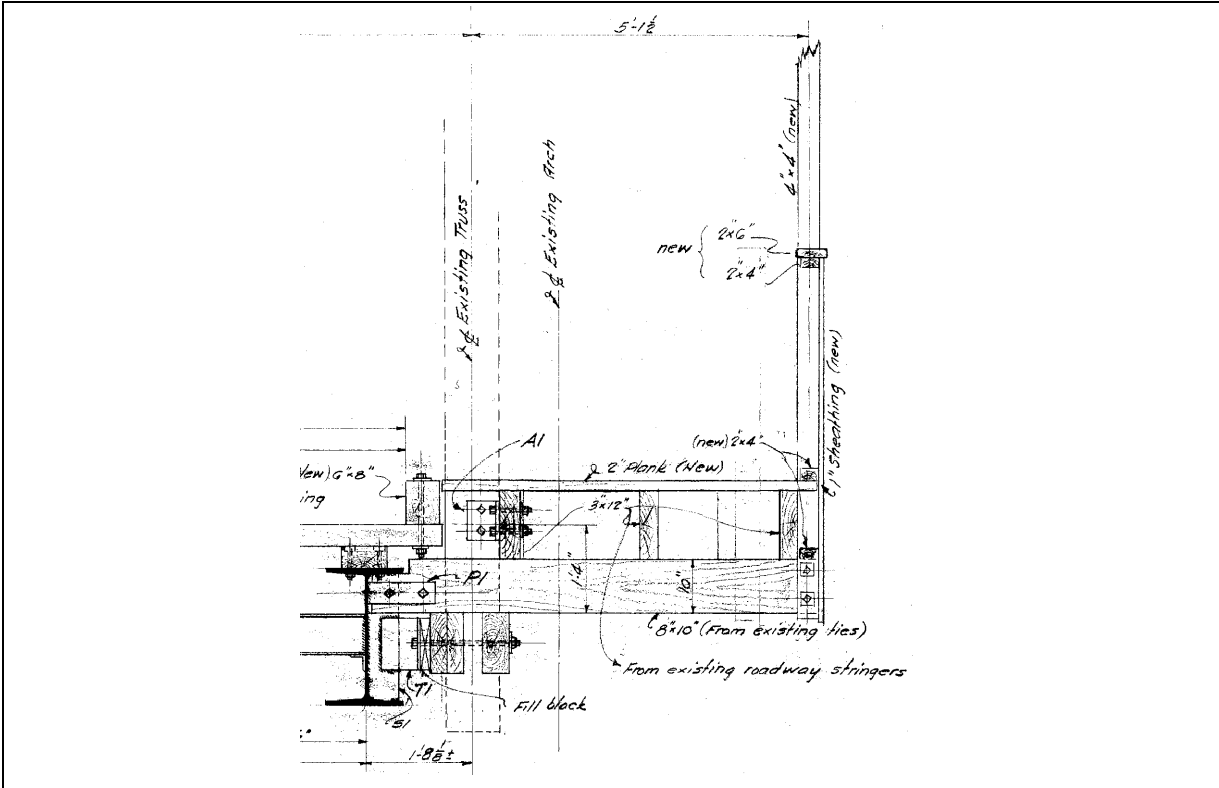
Sidewalk assembly, existing conditions, from 1954 repair plans. (source: NHDOT)
